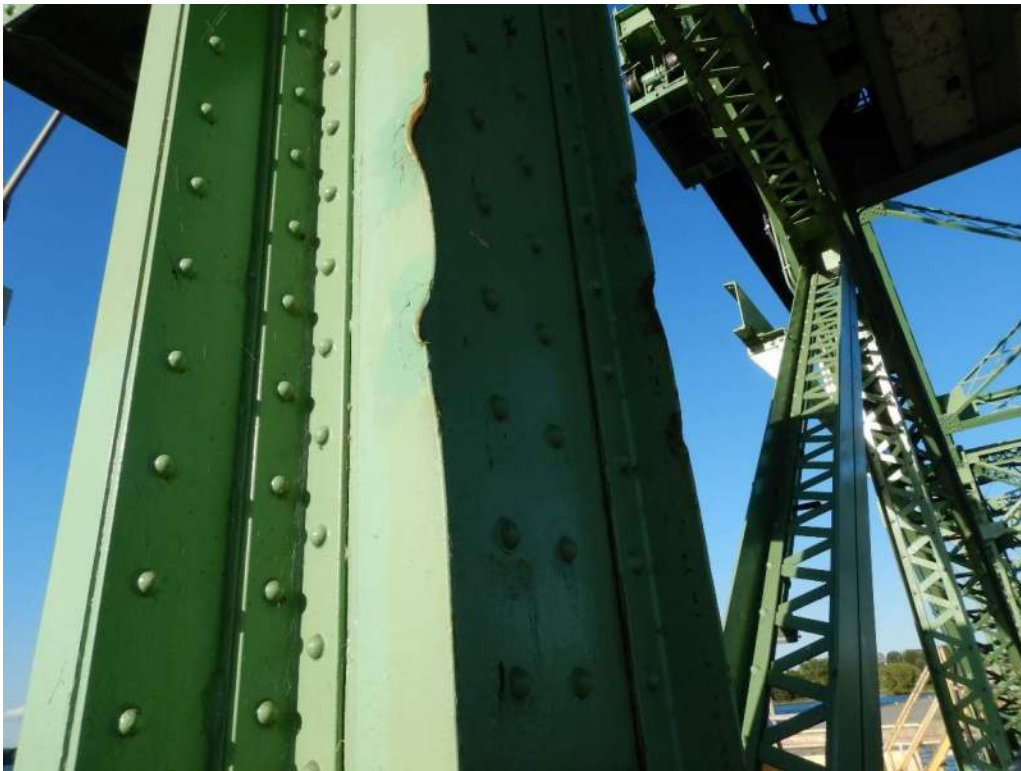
The southwest and southeast flanges of tower truss vertical member 19N-20N have deformations likely caused by impact damage.
